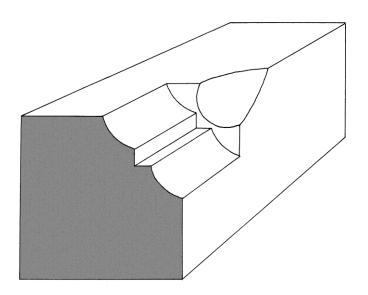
Moulding and chamfer stop on the eastern section of lower joist 2 from the floor of room 134. The timber would originally have had the moulding downwards.
